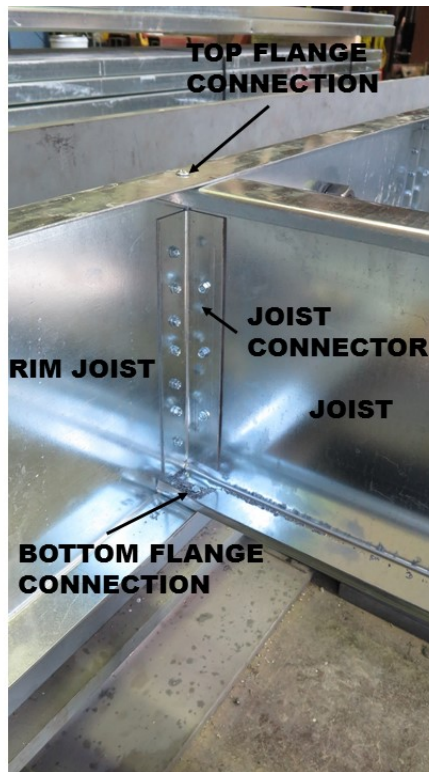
Roof Specimen Joist to Rim Joist Connection
